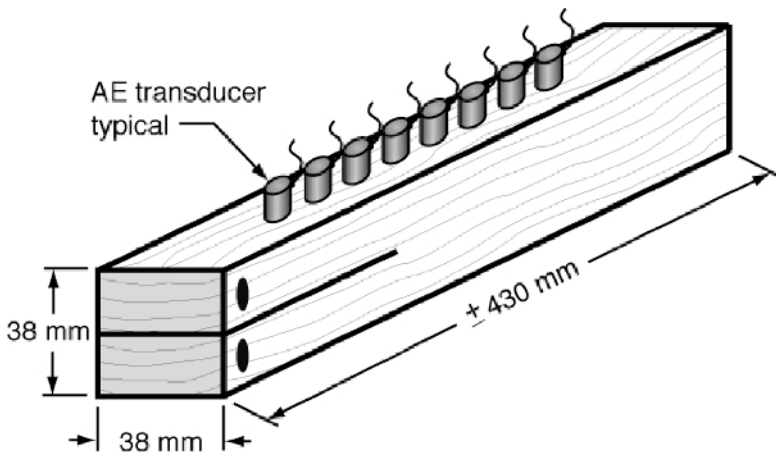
Specimen geometry for AE/fracture experiments.
